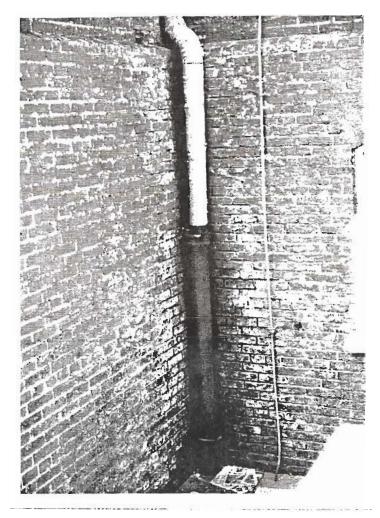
Downspout and Cast Iron Boot at Southwest Corner.
